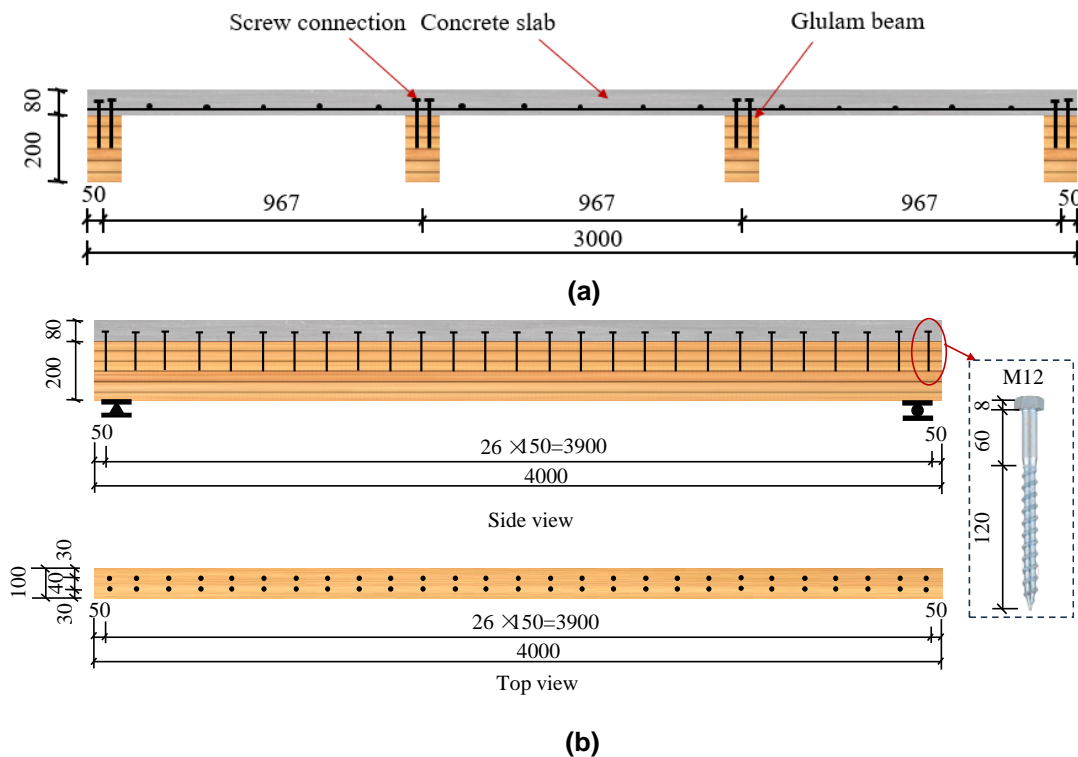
Details of composite slab specimen: (a) Cross-section of the composite slab; (b) Arrangement of screw connections in the wood beam
